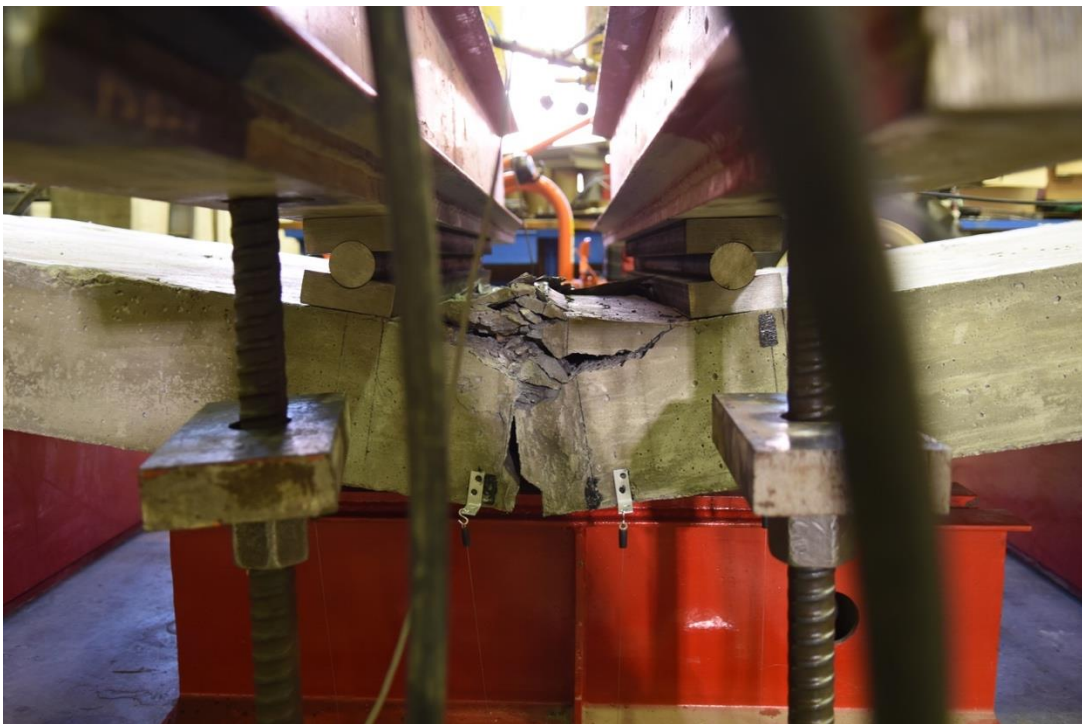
Grouted Joint Close-up Photo at Failure (Specimen F-F-1)
